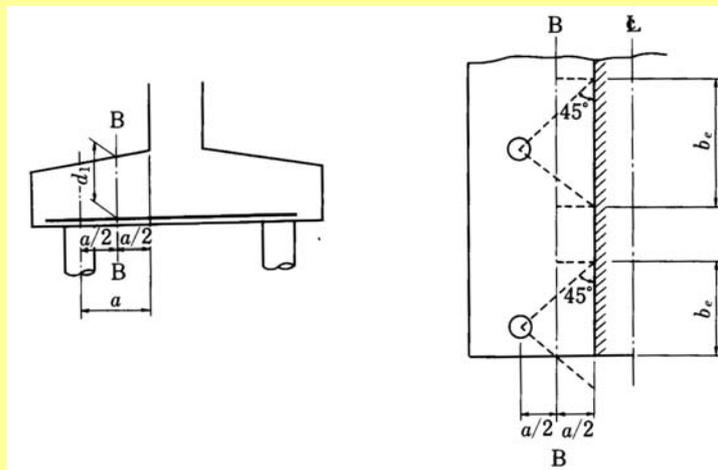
Critical cross section of footing for shear adjacent to column or wall
